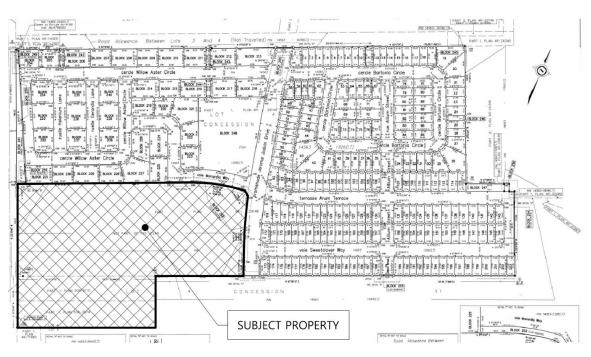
Mattamy's Summerside West Plan of Subdivision 4M 1850
